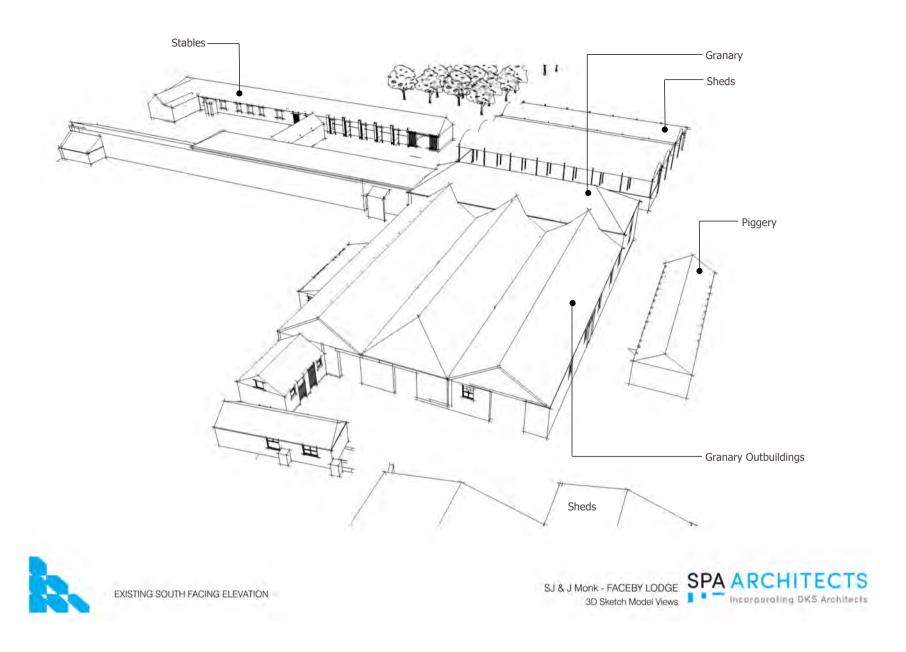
Perspective drawing of Existing Buildings as viewed from the south.
